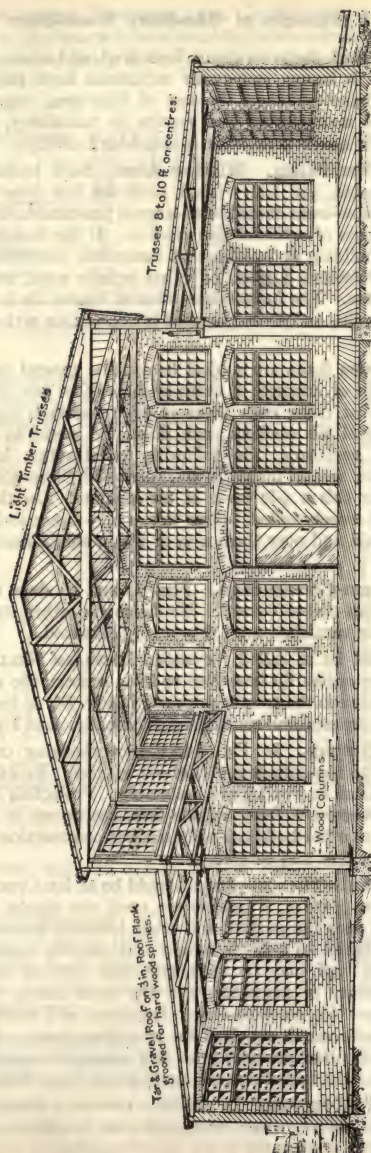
One-story Work-shop. Roof-boards on Trusses
